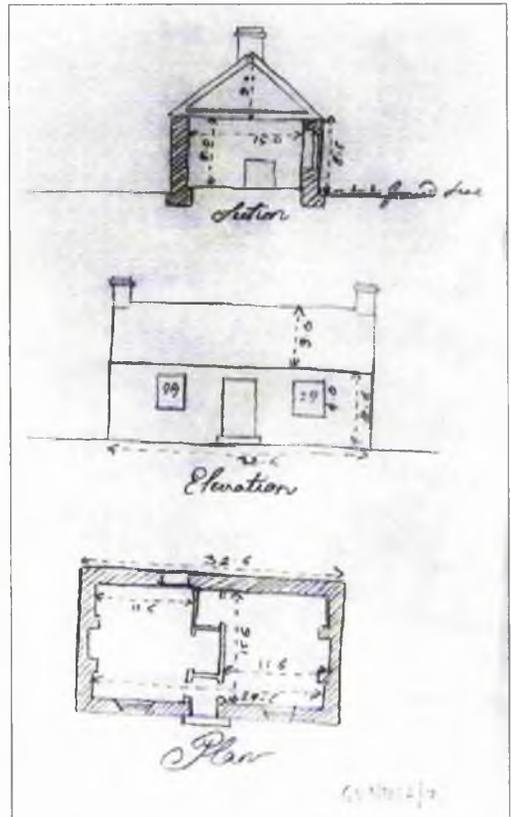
John Forsyth, plan, elevation and section for smithy at Lochbay, 1798, NAS GD9/32/2/7 (tracing from original).
